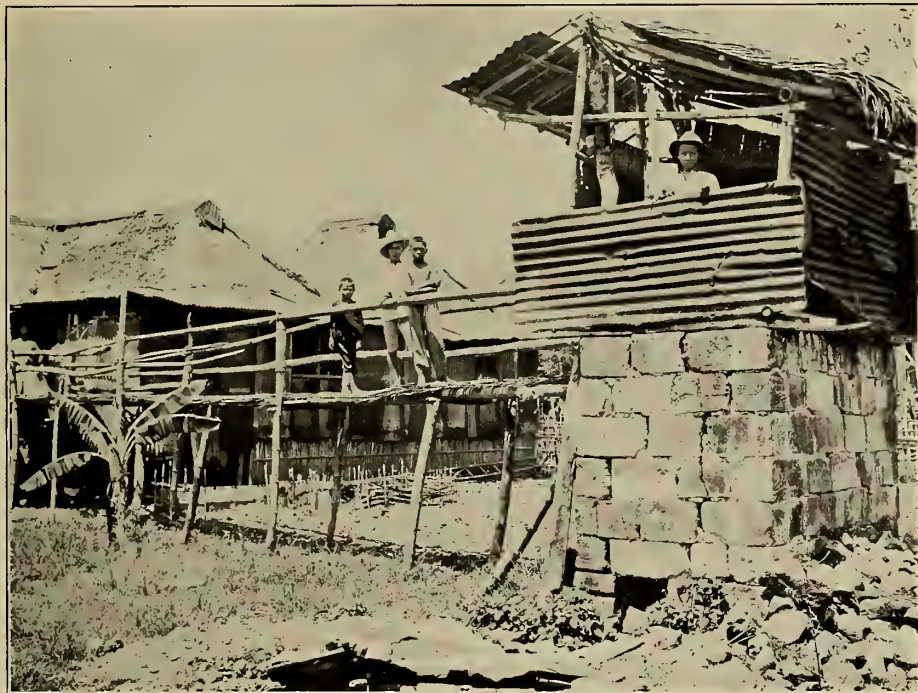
OUTHOUSE WITH BRIDGE FROM HOUSE.
